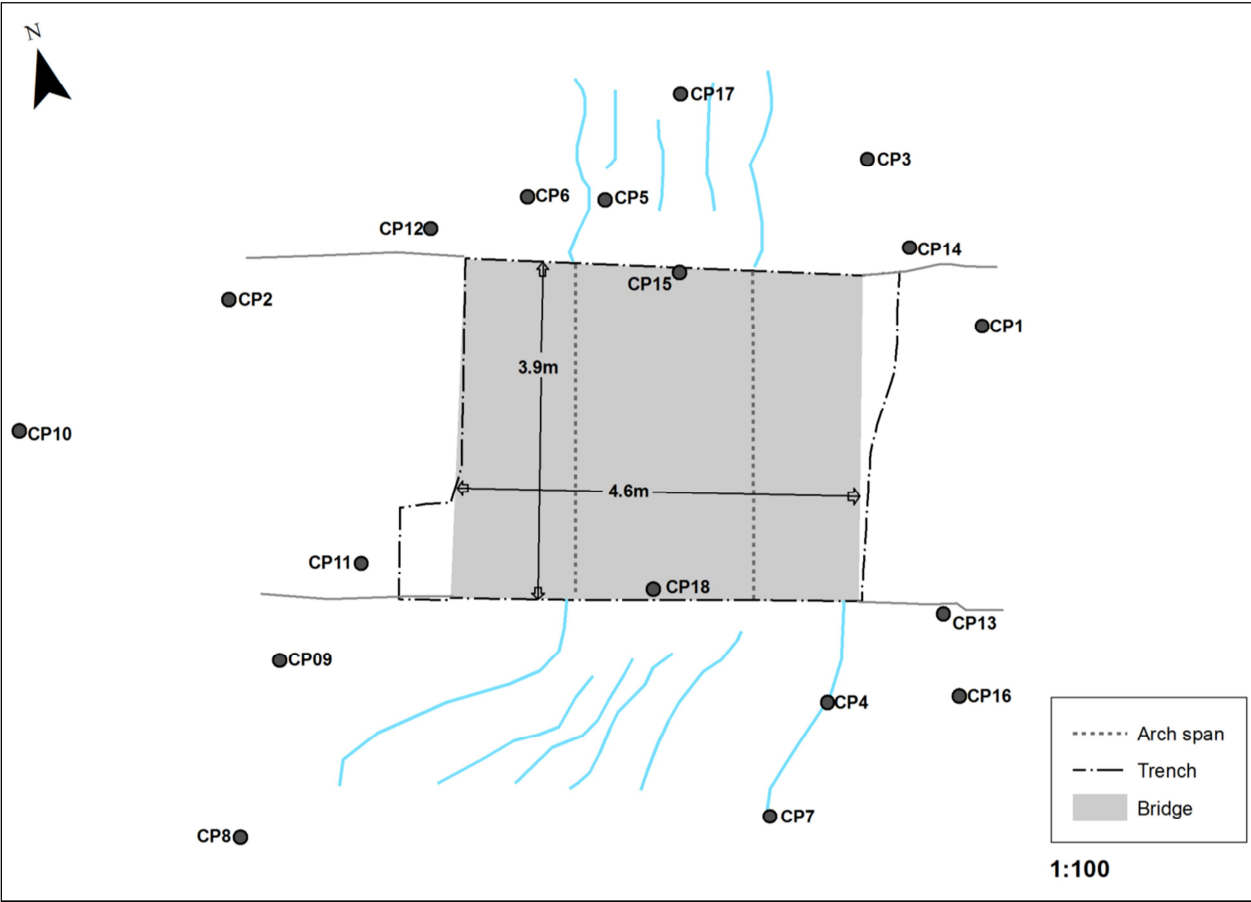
Sketch plan of Bridge 008 showing trench location and camera positions marked by “CP”
